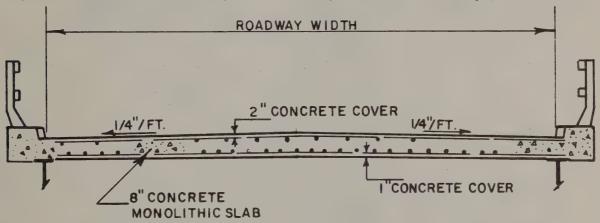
Typical Transverse Section 8"- Monolithic Bridge Deck
